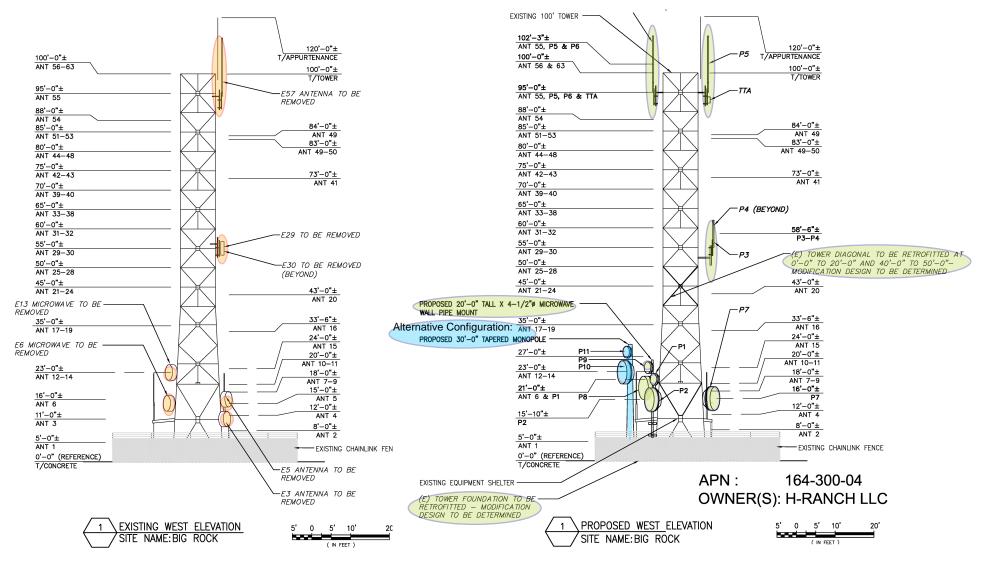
Site 3 - Big Rock Ridge Existing and Proposed Elevations
